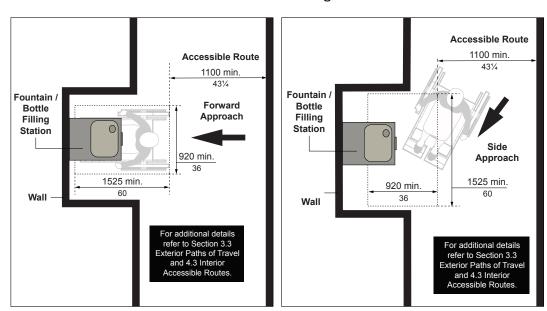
Clear Floor Space Requirements and Approach at Recessed Drinking Fountain / Bottle Filling Station - Plan View
